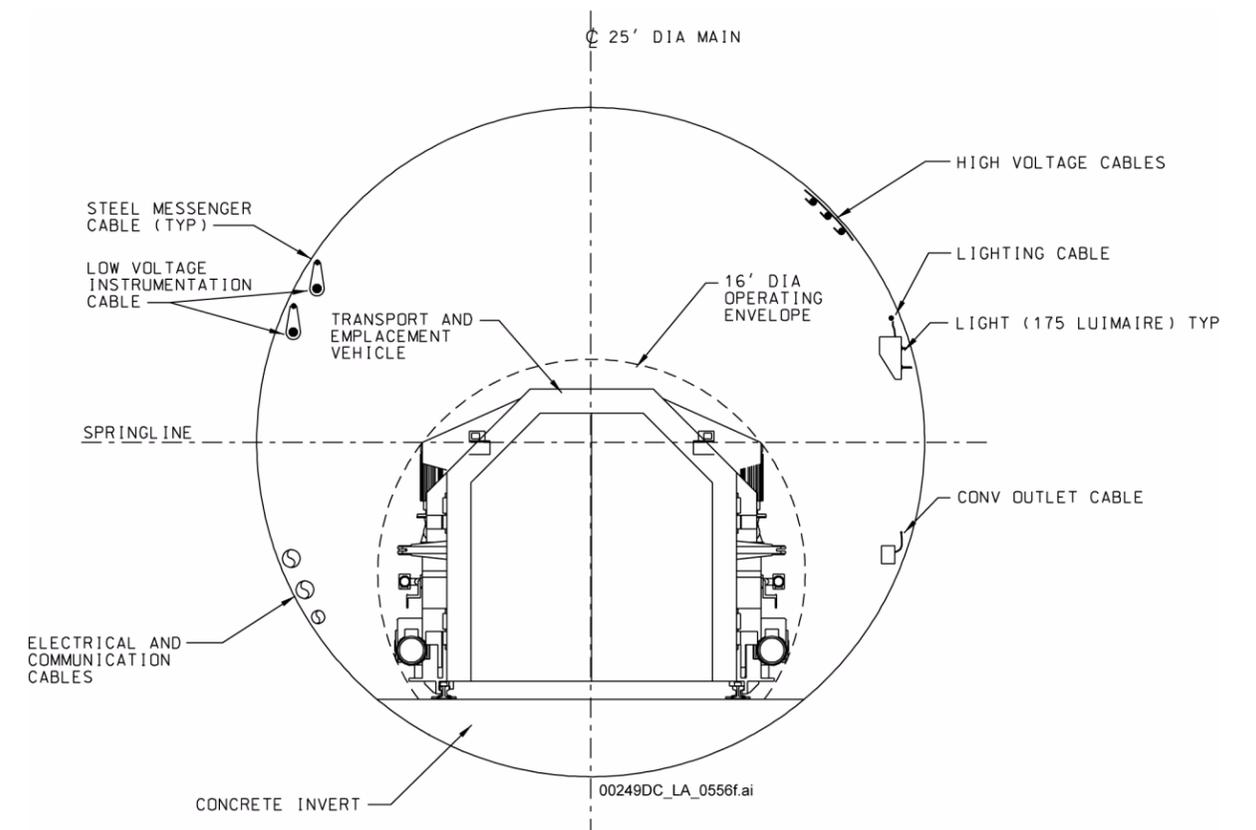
Typical Access Main Finished Cross Section
